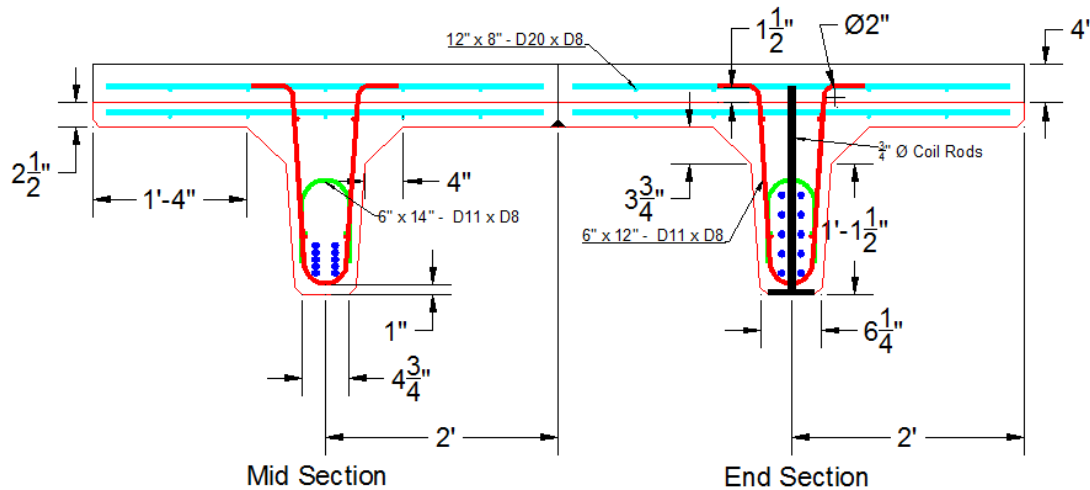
BDT girder cross sections, mid-span section (left) and end-span section (right)
